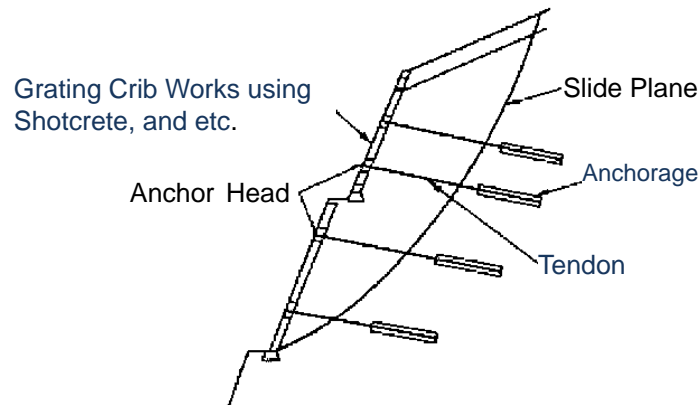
EXAMPLE OF ROCK BOLT TYPE ANCHOR
